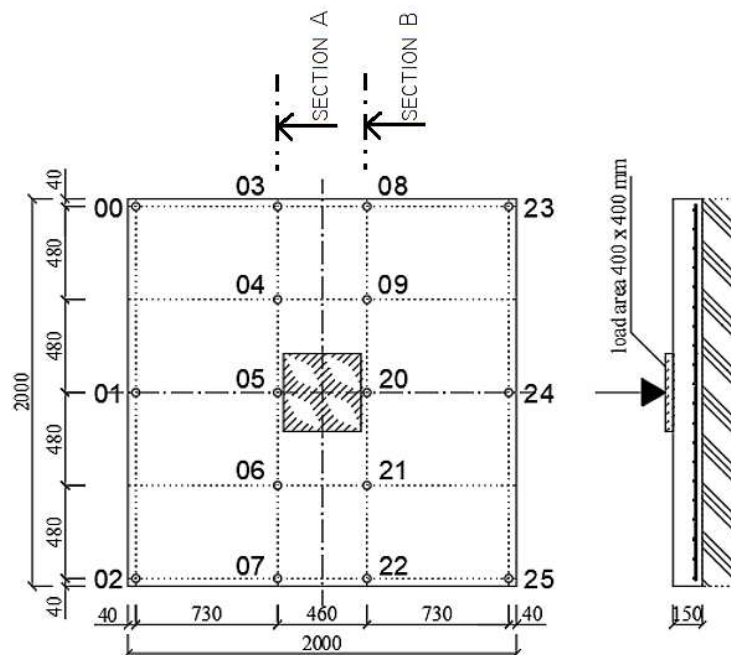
The reinforcement concrete slab: scheme of the experiment.
